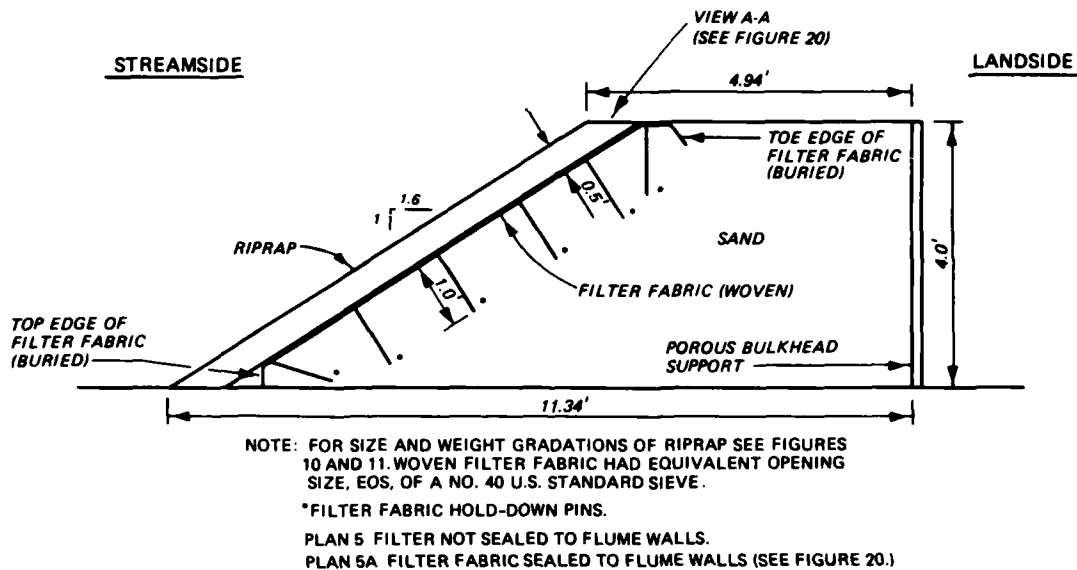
Plans 5 and 5A, sand streambanks with 0.5 ft of riprap and woven filter fabric protection
